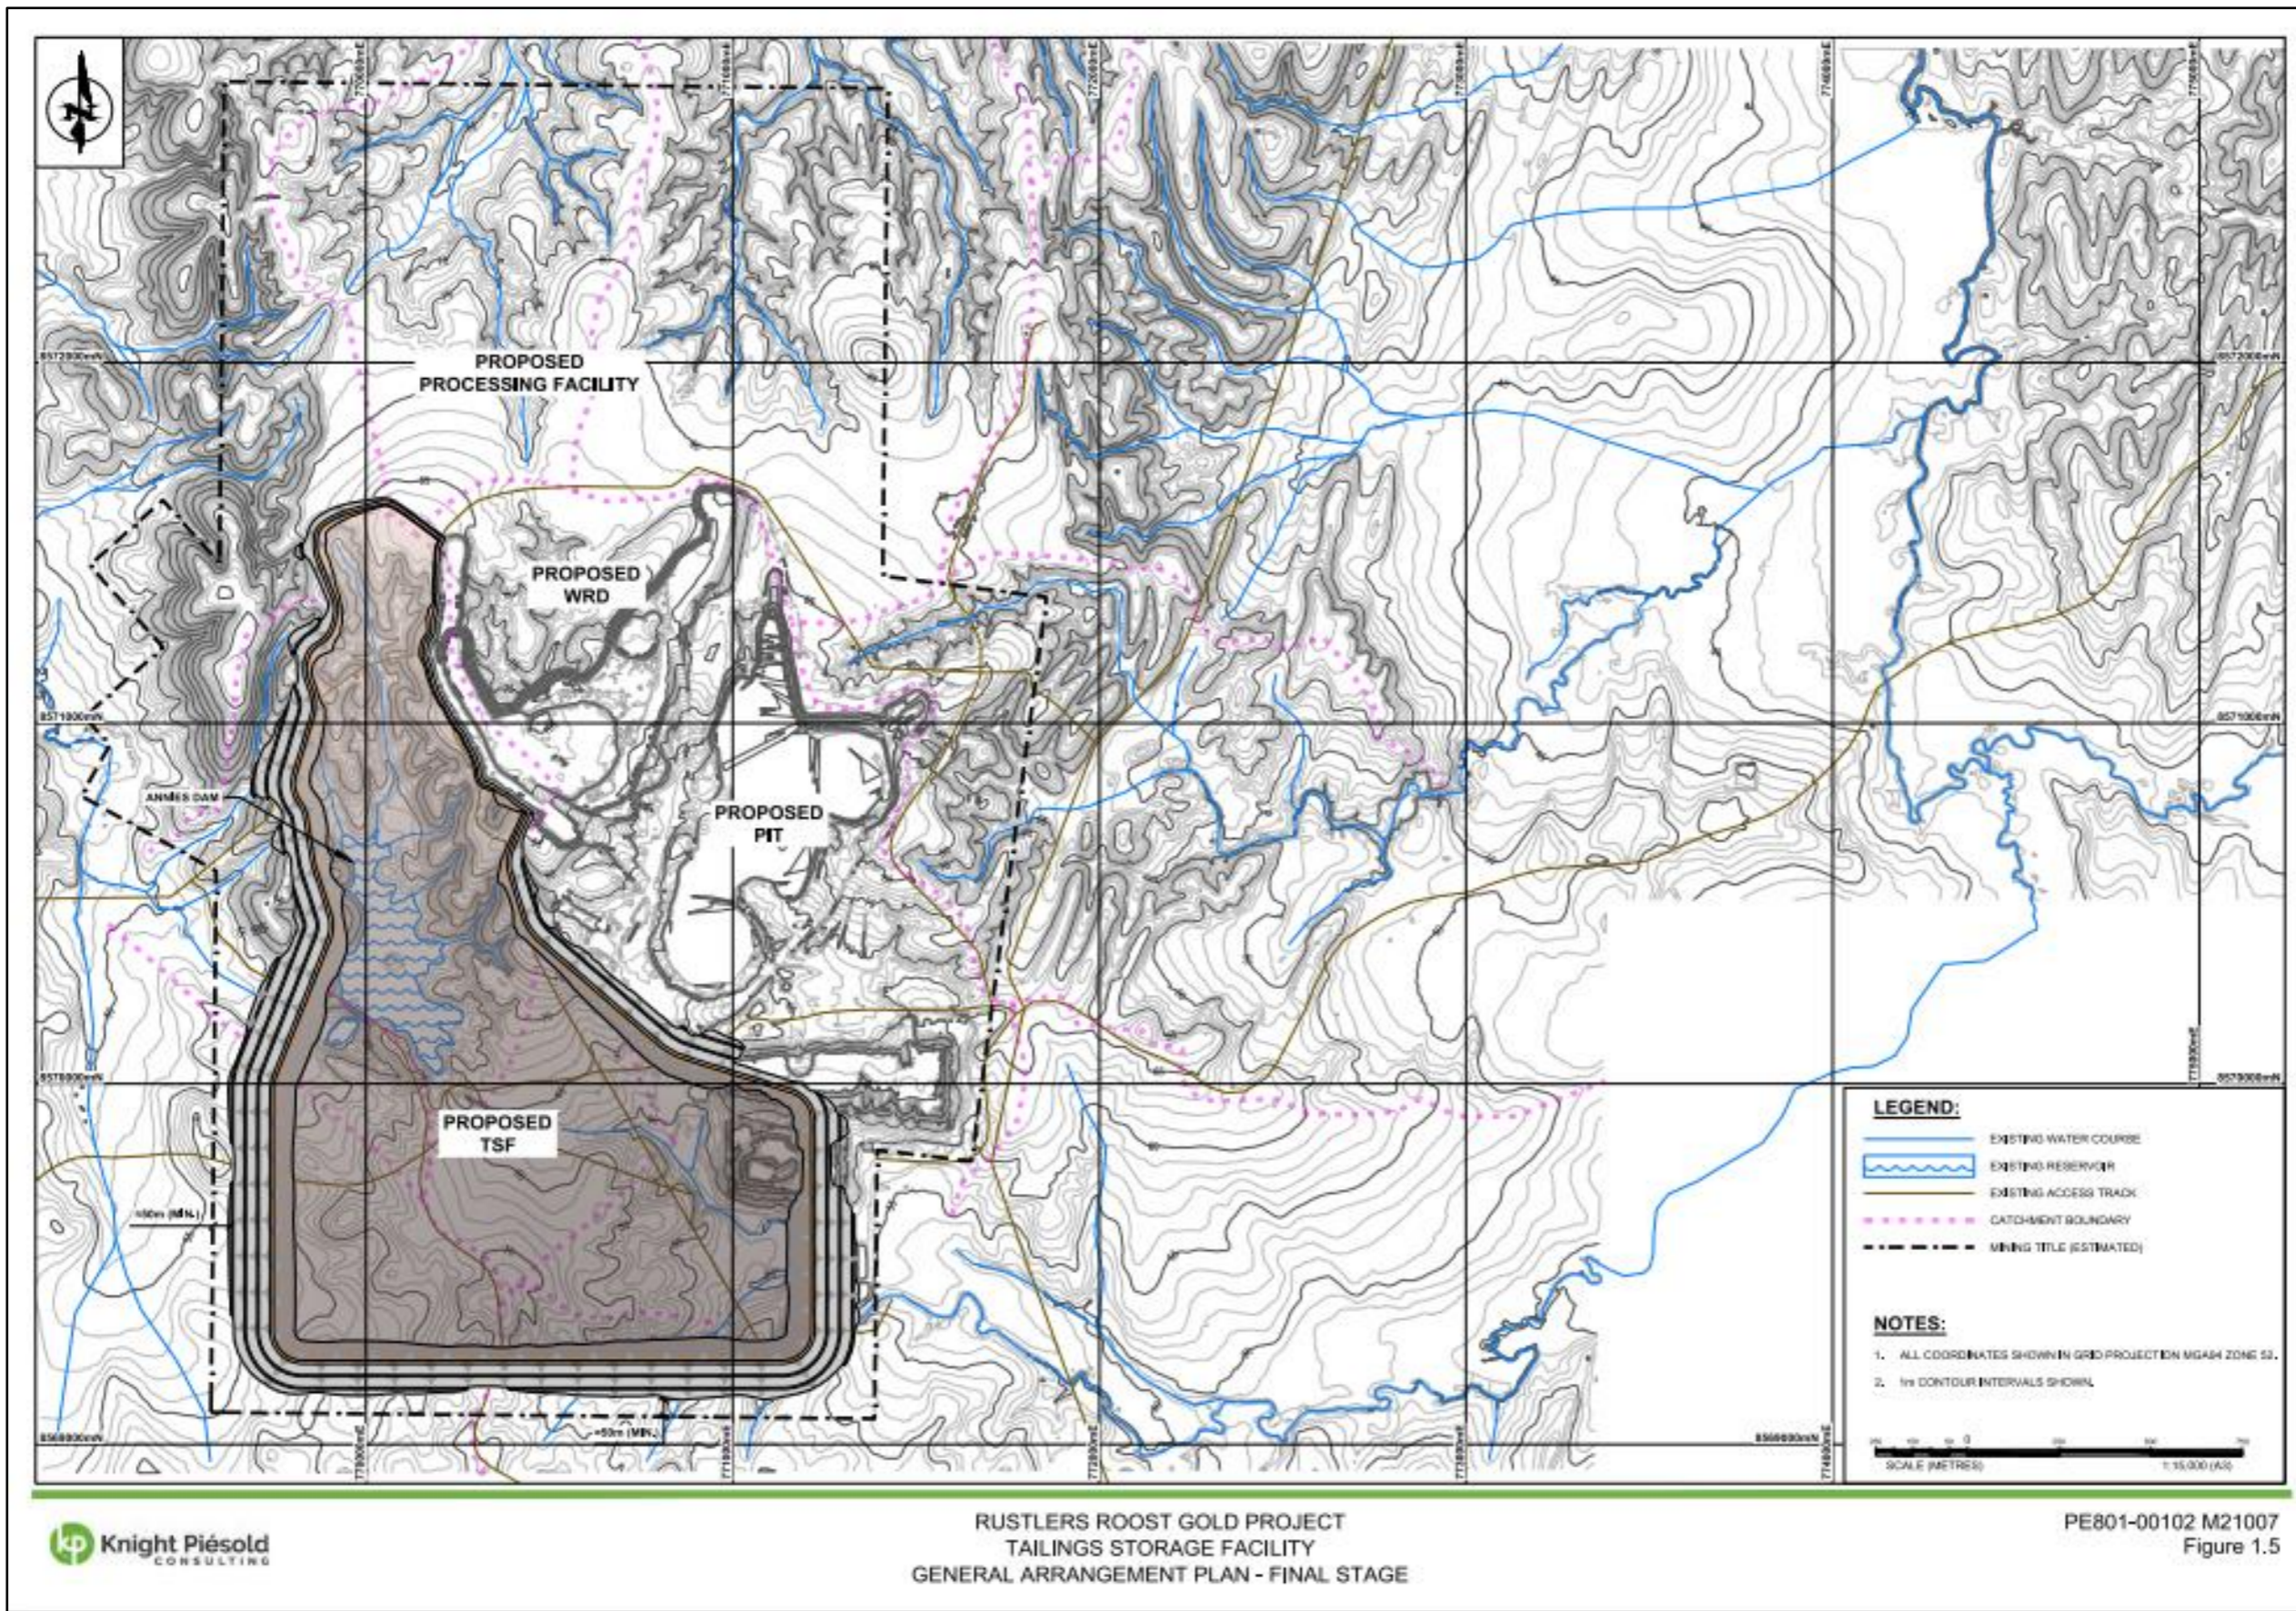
Rustlers Roost TSF general arrangement plan - Final Design
